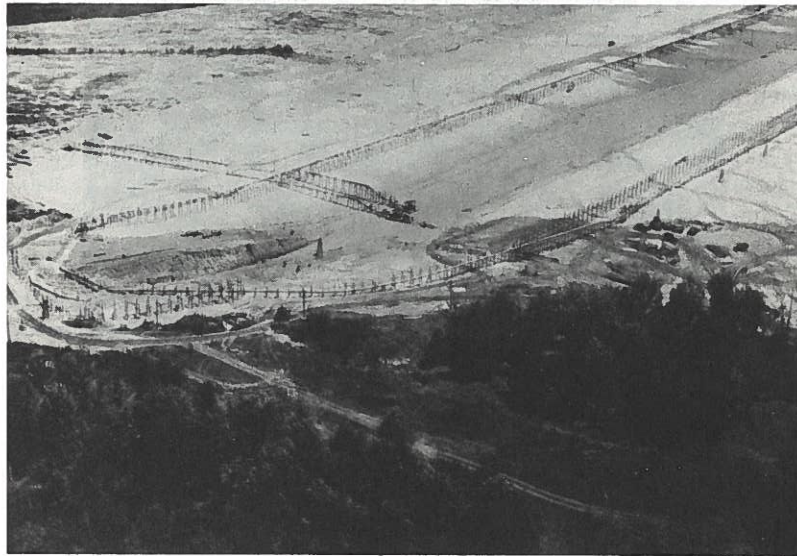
Traplines on Beaches and Around End of Core Pool—Sardis Dam
